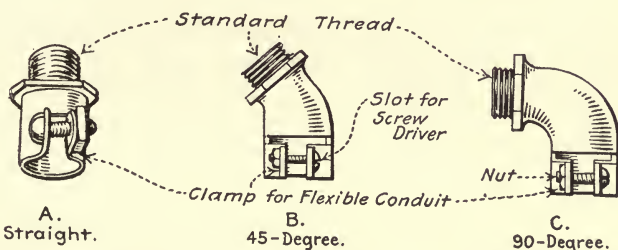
Angle connectors for flexible conduit and steel armored cable.
